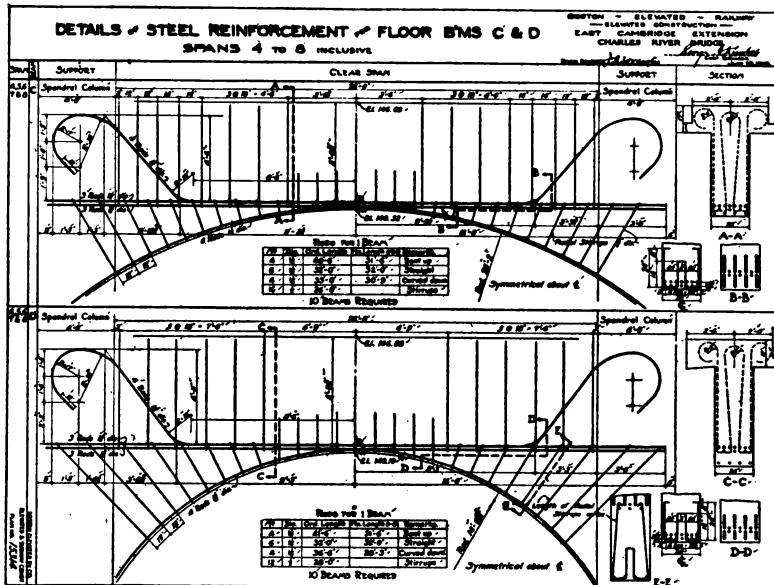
REINFORCEMENT FOR FLOOR-BEAM OR JACK ARCH.
